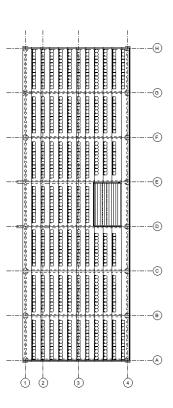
Level 0 Floor Plans and Landing Level Seating Plan
